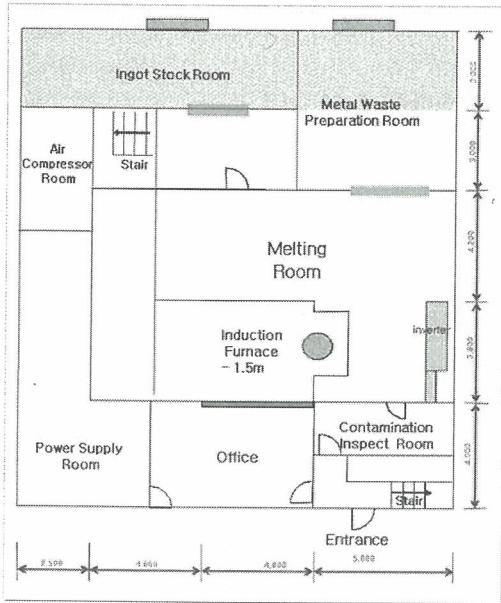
1<sup>st</sup> floor plan of melting facility.
